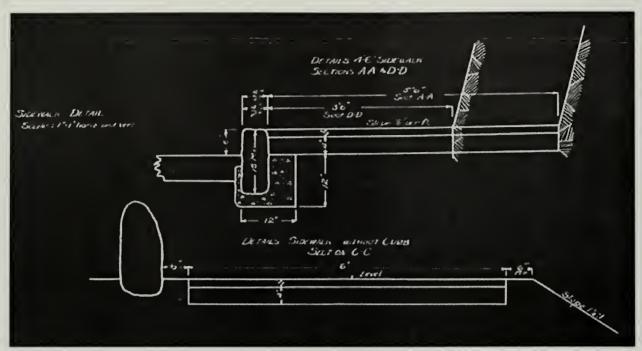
Detail of paved walkways, with and without curbs, at the parking lot on Cadillac Mountain summit. (U.S. Department of Agriculture, Bureau of Public Roads, Project 1A, 1931)
